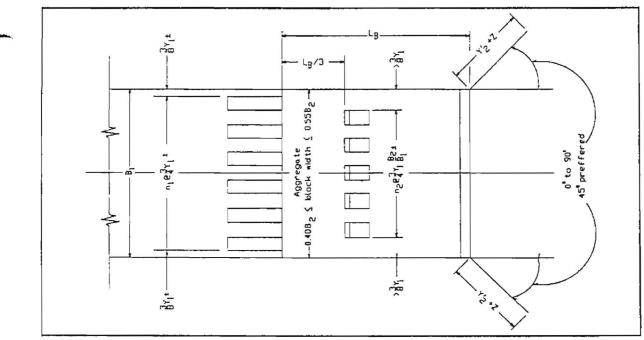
Plan View of Rectangular SAF-Type Stilling Basin
